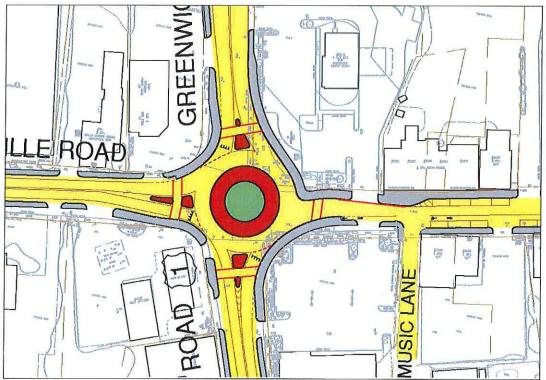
Single-Lane Roundabout at Centerville Road and Greenwich Road (Source: RIDOT)
